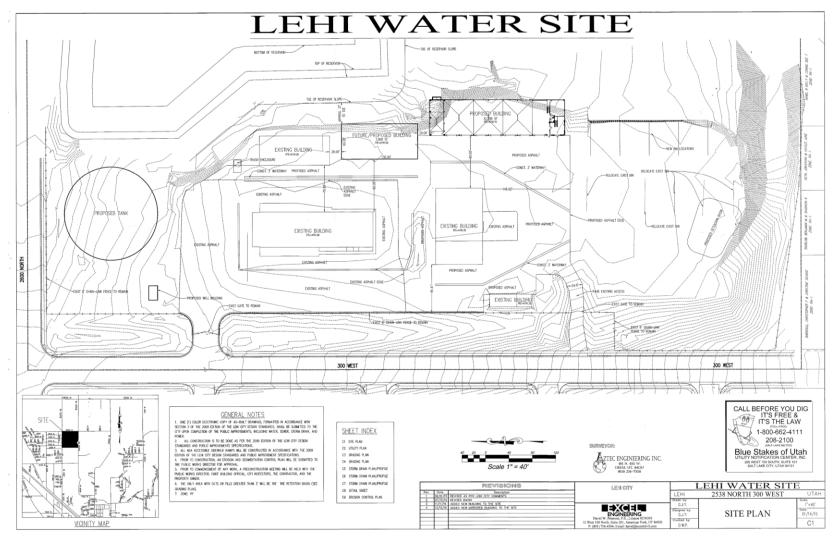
Civil Plans for the Lehi Water and Streets Departments public works buildings. All the proposed buildings have been completed besides the Sand
